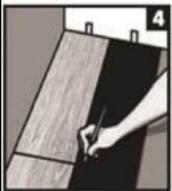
Place the last plank face down with the short side (without the locking side) facing the wall as indicated. Be sure to allow for the 1/4" (6mm) expansion space next the wall and draw the cut line.
